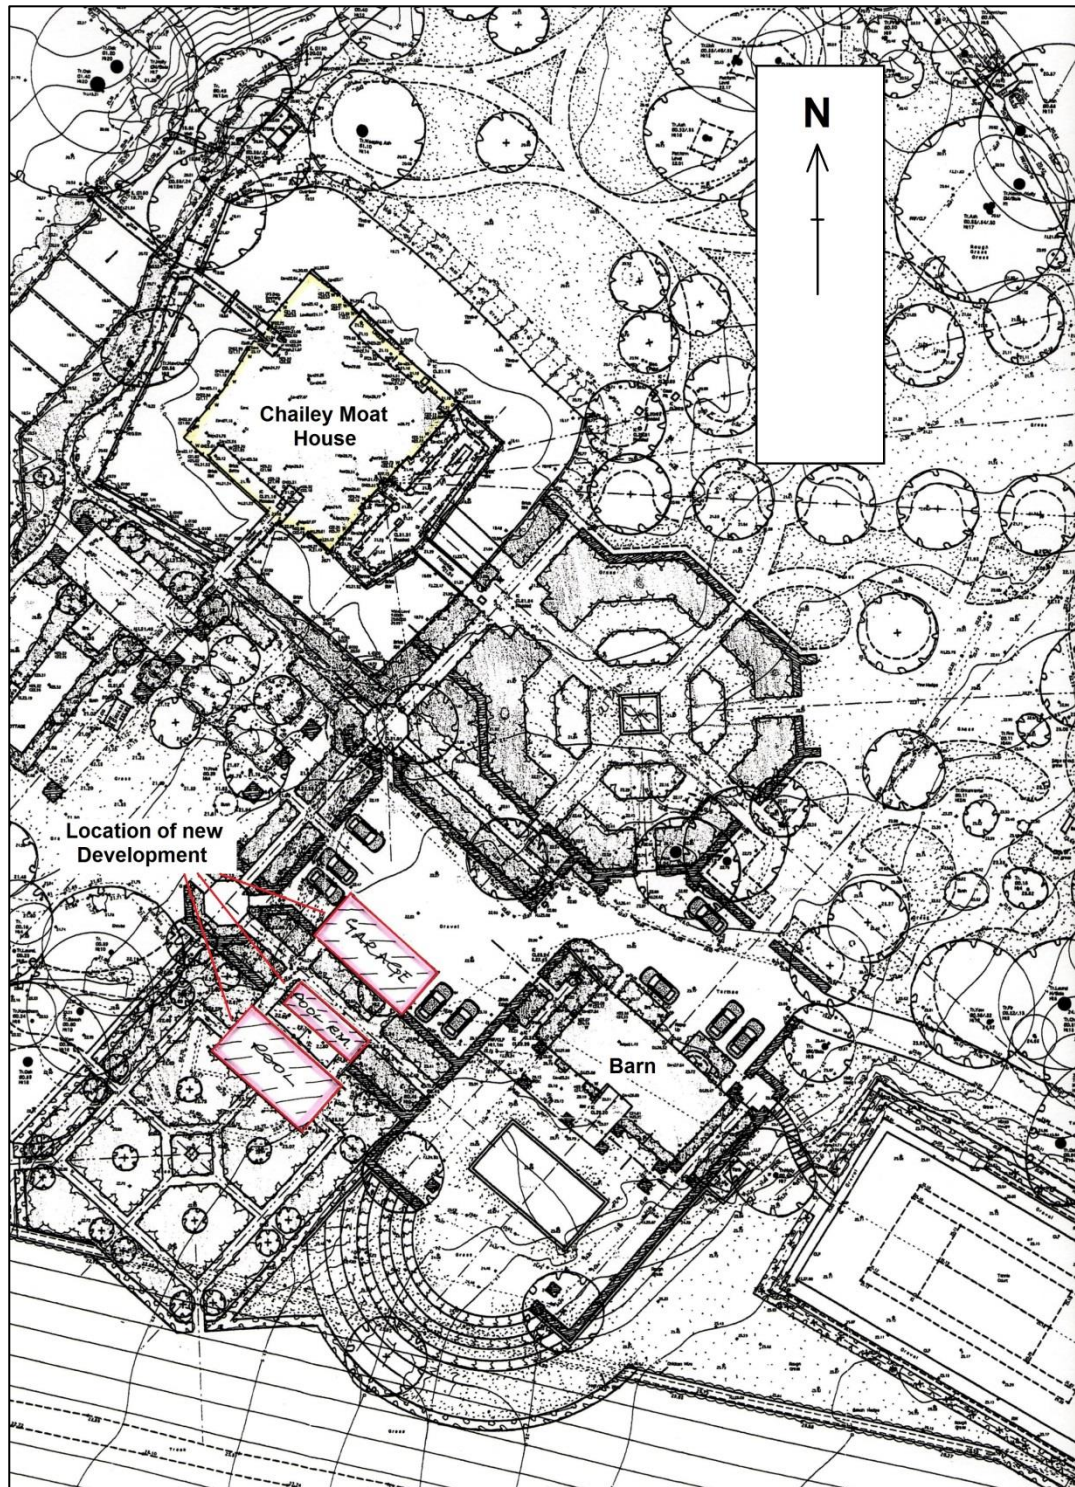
Chailey Moat, Chailey: Development plan showing new pond, pool room and garage.
